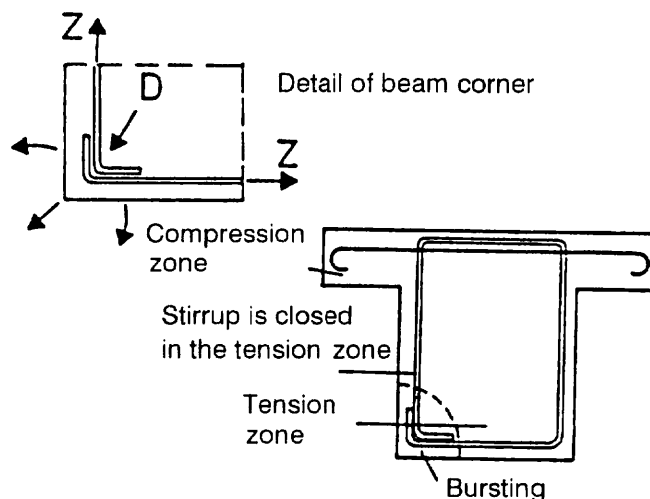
Failure mechanism in a beam with stirrups spliced by overlapping of bends, after Rehm and Neubert (1974)
